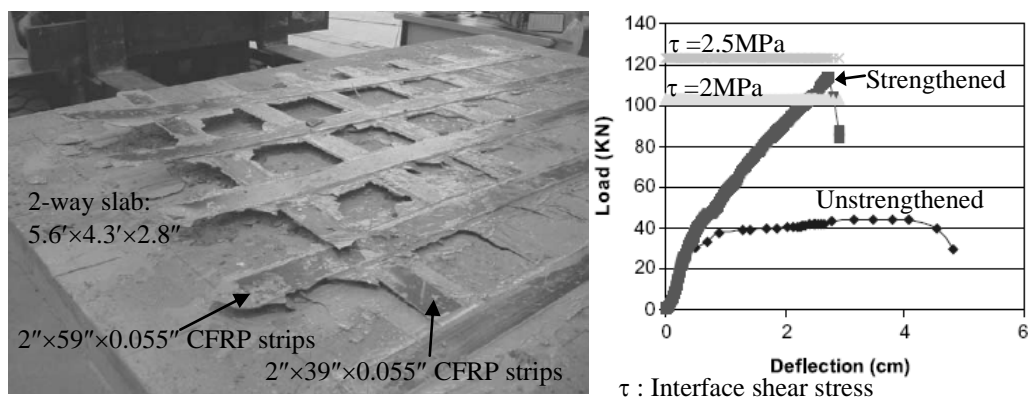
Debonding failure of CFRP strengthened slab (Limam et al. 2003)
